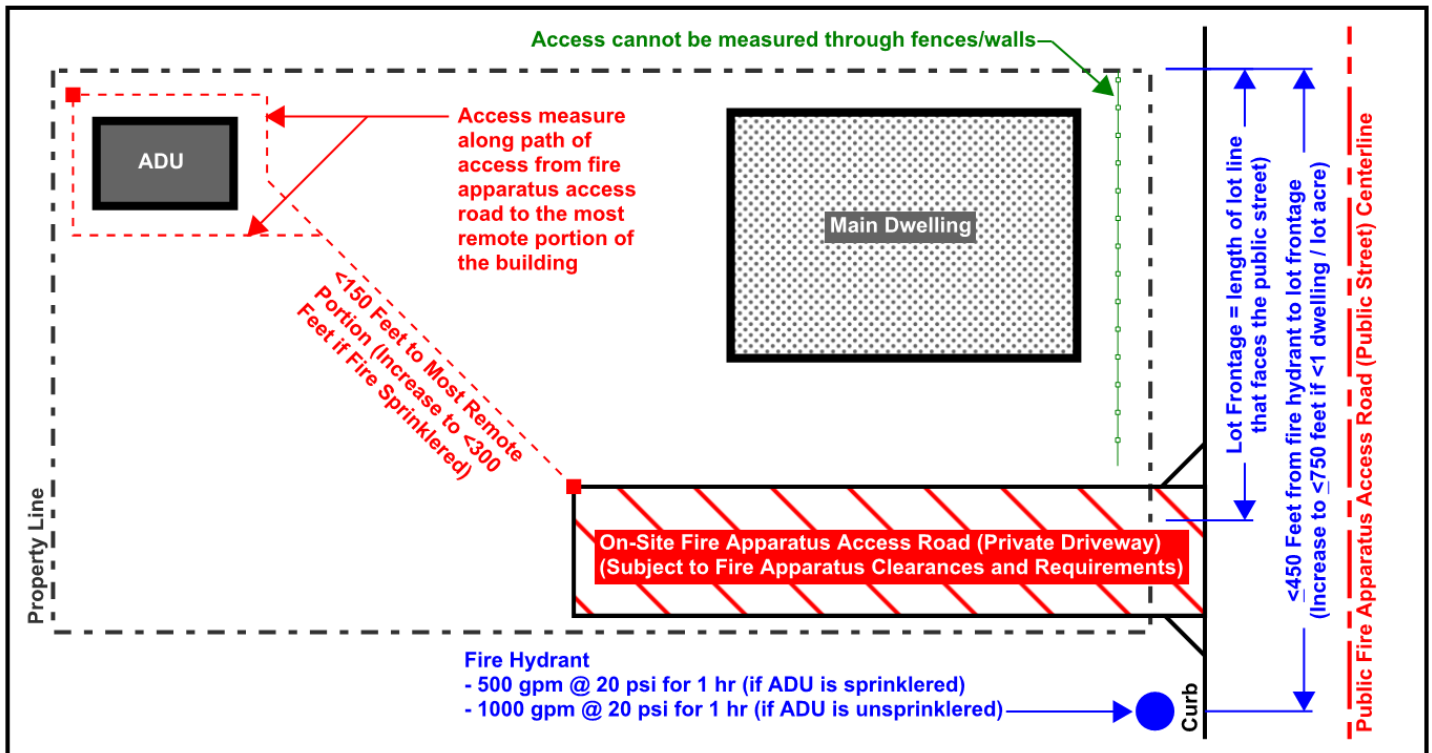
ADU Access From On-Site Fire Apparatus Access Road (e.g., Private Driveway)
